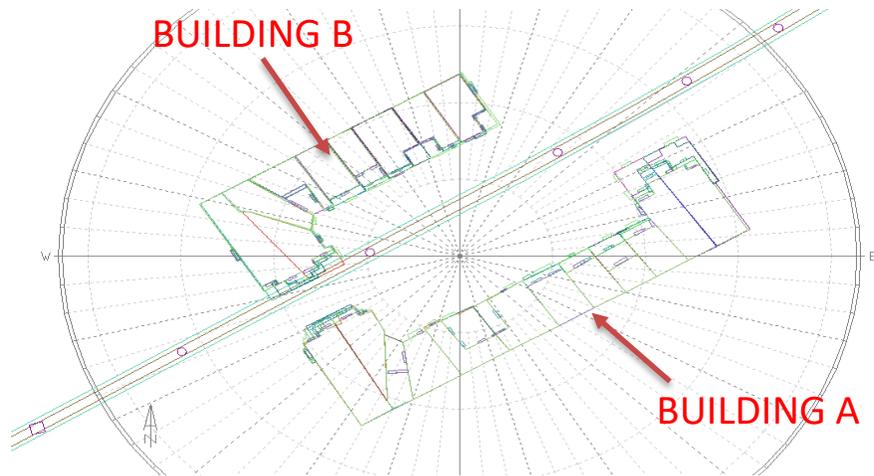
PLAN VIEW OF THE BUILDINGS & VIADUCT
